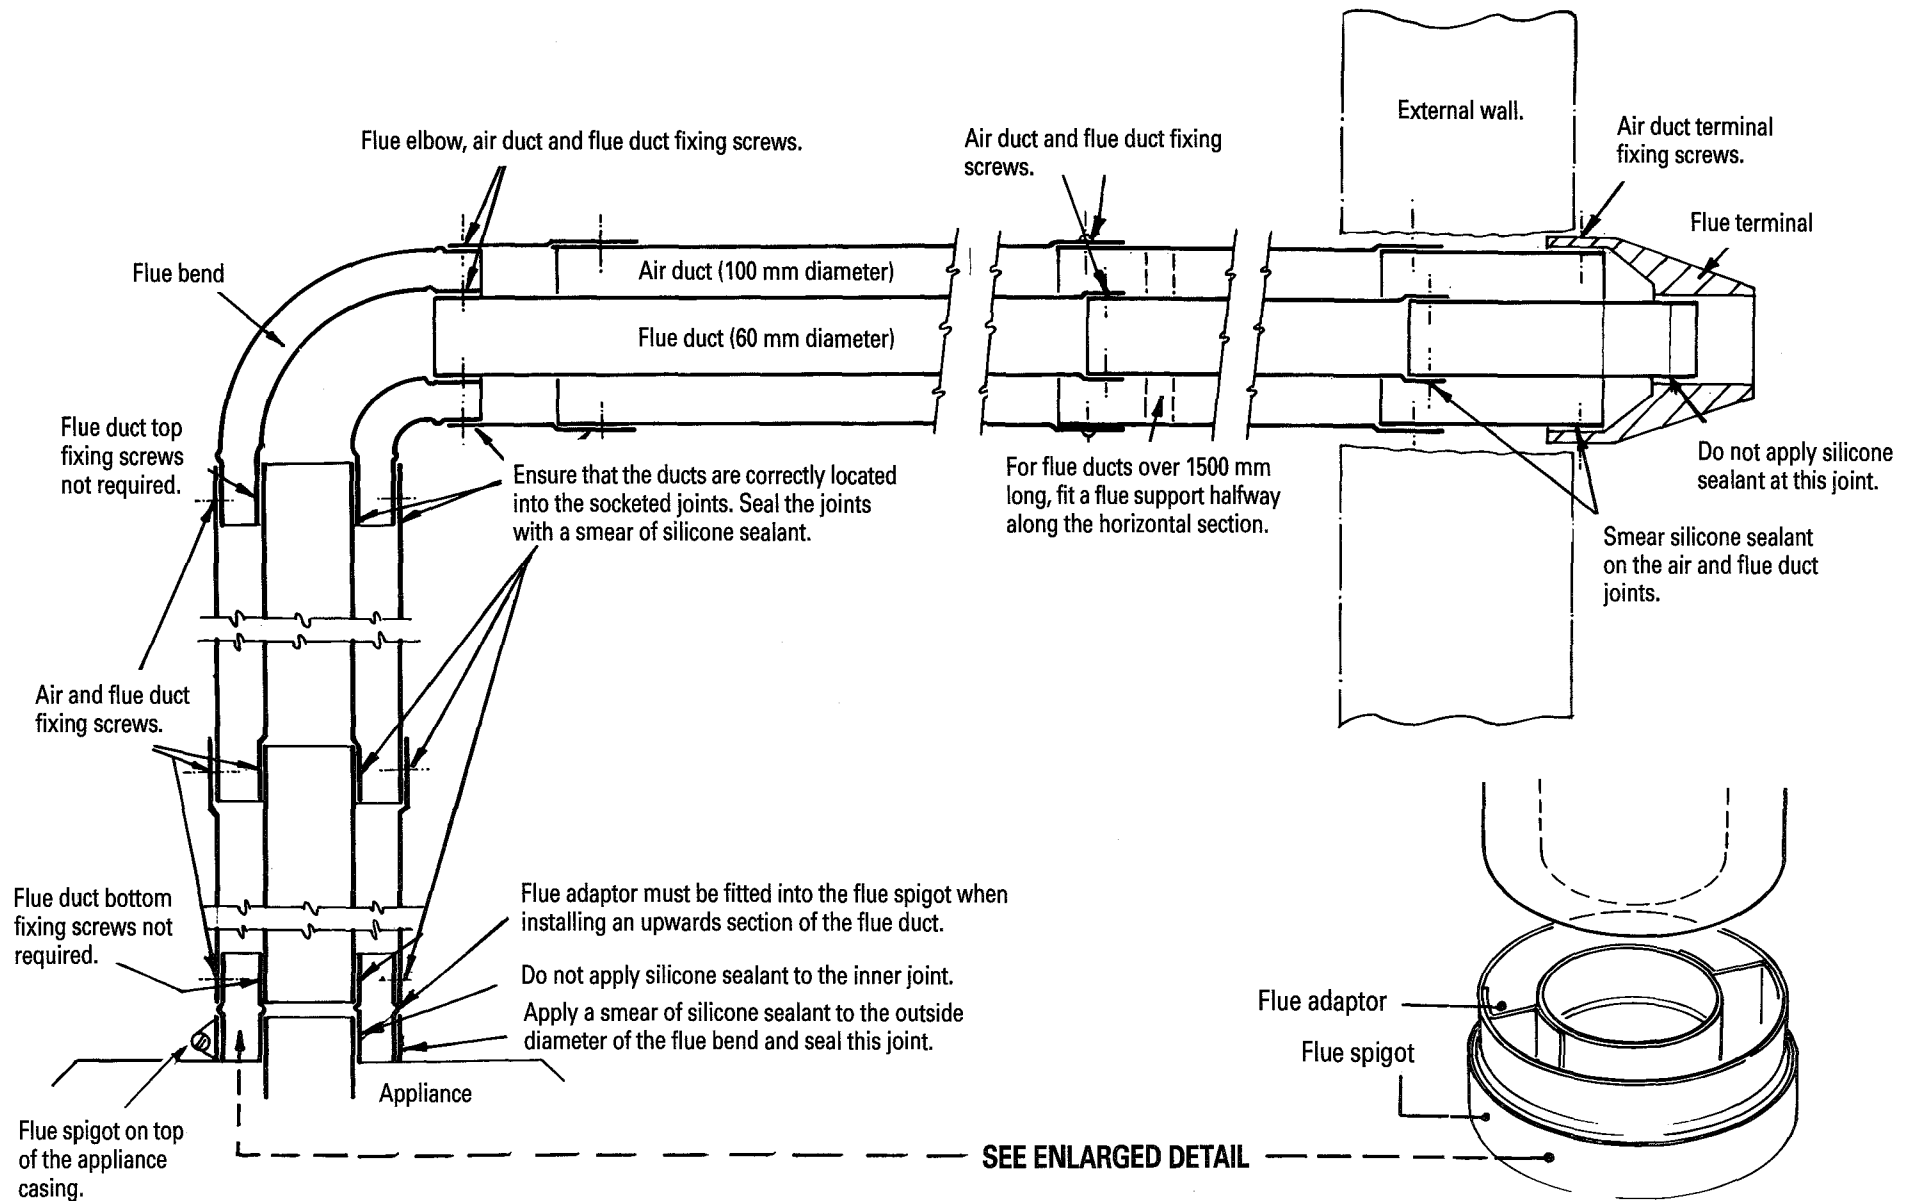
Typical extension flue assembly showing horizontal section and upwards section.
